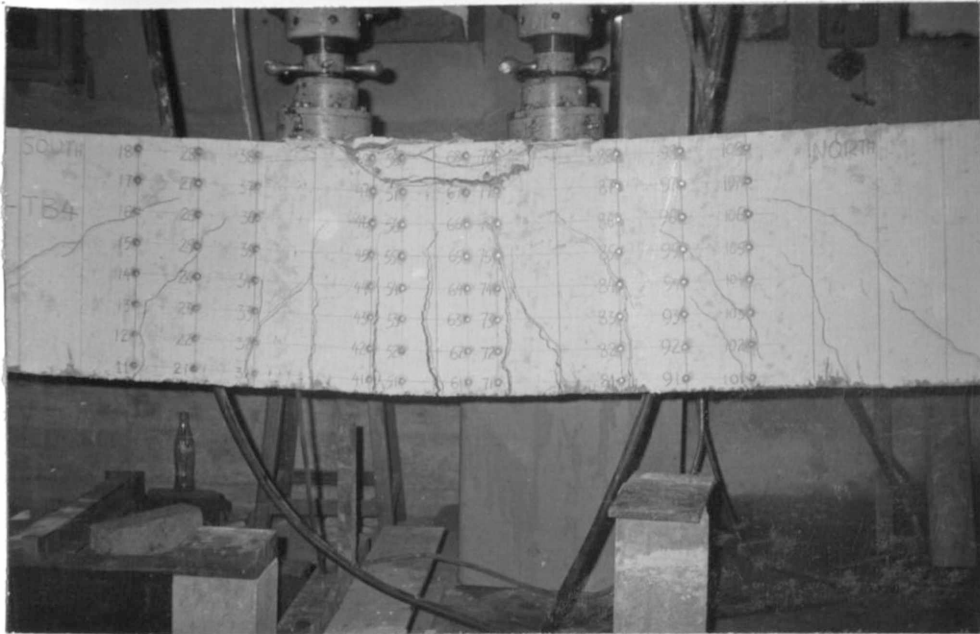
Beam CFT-TB4 at Capacity Loading
